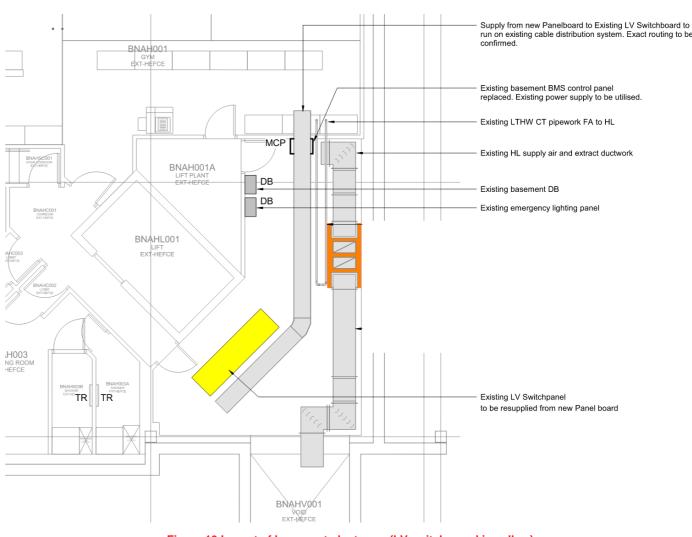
Layout of basement plantroom (LV switch panel in yellow)
